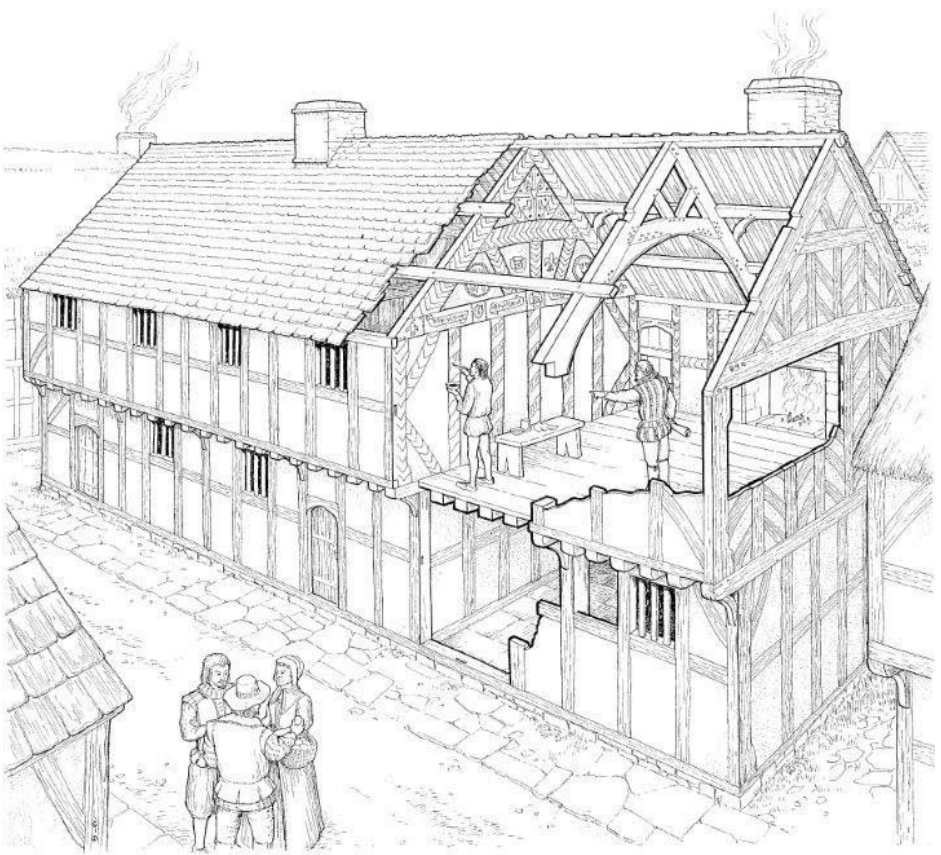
George & Dragon Hotel, Beaumaris: a jettied, timber-framed merchant's house built in 1541. The cutaway drawing shows the painted first-floor chamber. Copyright: Paul Davies.
